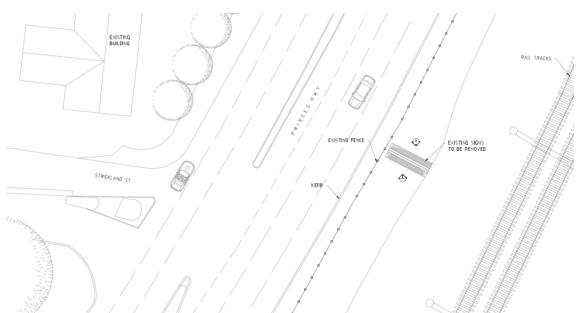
Site Plan- signage to be removed (Source: Dennis Bunt Consulting Engineers)
